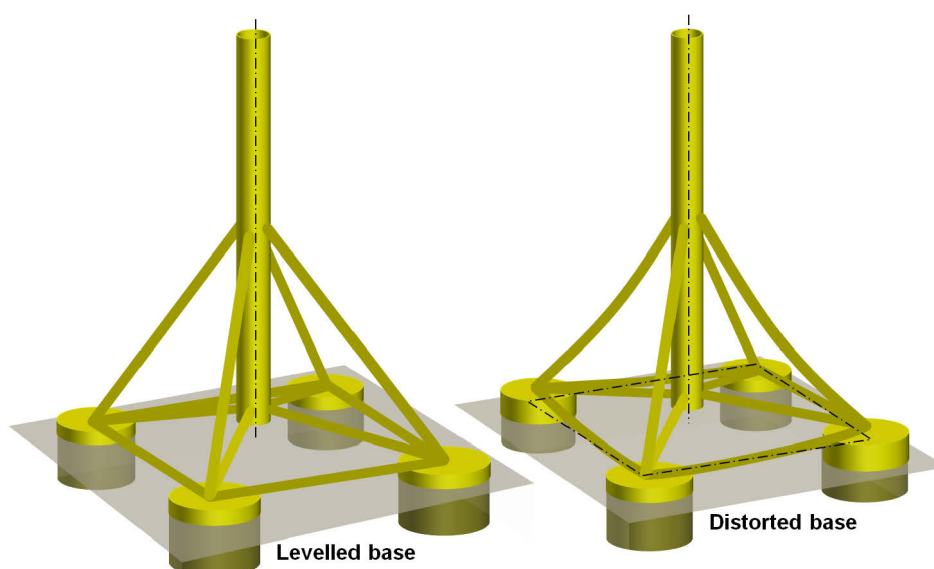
Vertical four legged caisson foundation with levelled or distorted base
